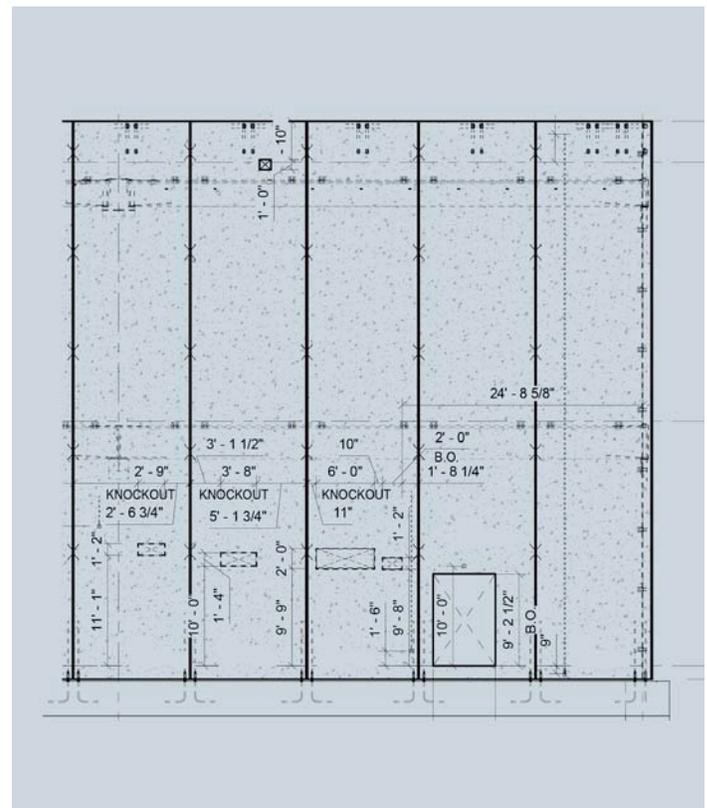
Partial elevation of non-loadbearing wall (56–10½" tall)
